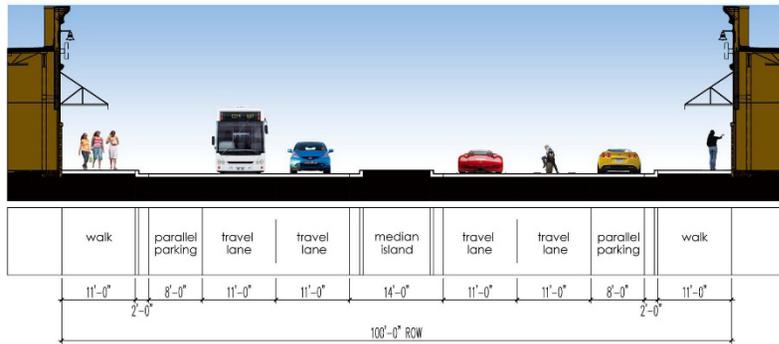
Segment 4 (Ridgewood Avenue to Beach Street)
